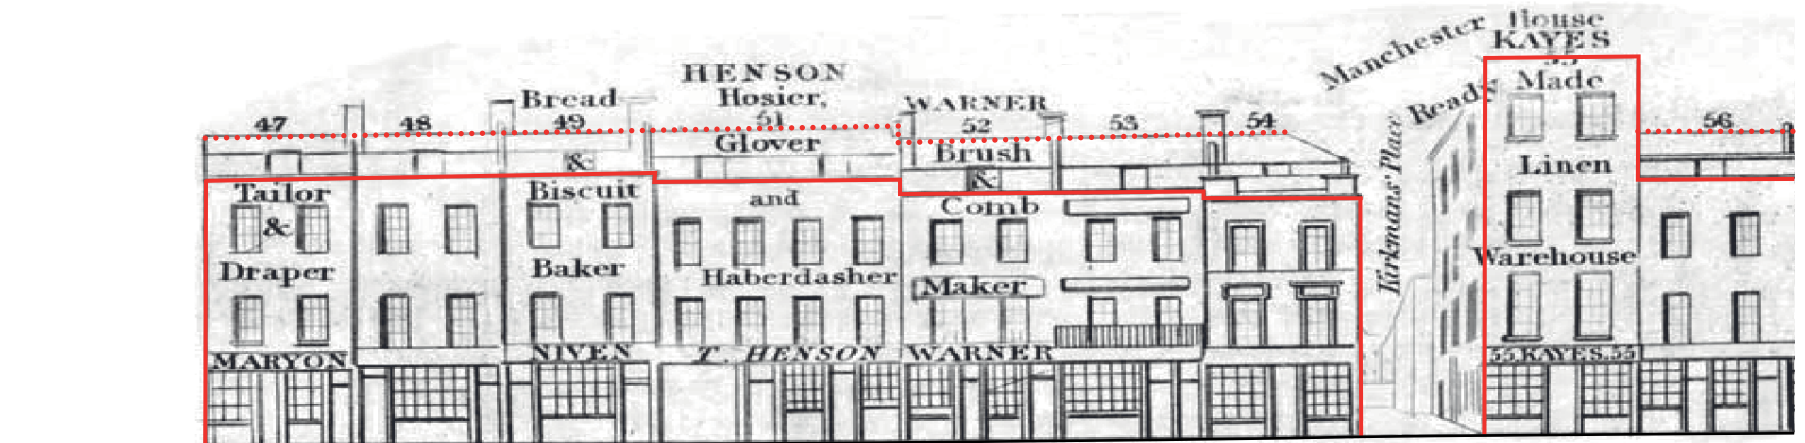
John Tallis Elevation of Tottenham Court Road 1838-40 - Red line indicates building parapet heights; dotted line indicates mansard roof heights - 19C
